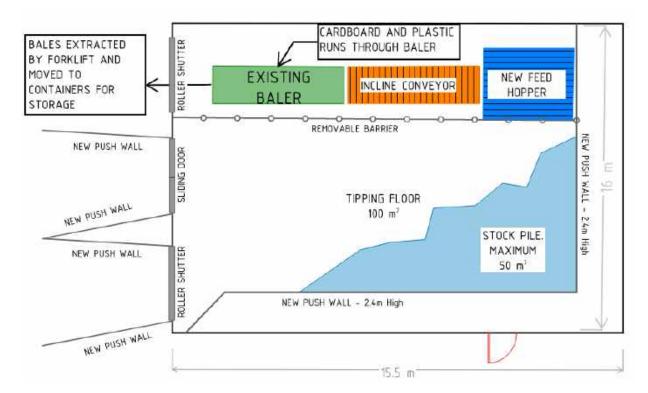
Existing Structure - Proposed Baling Shed - Plan View
